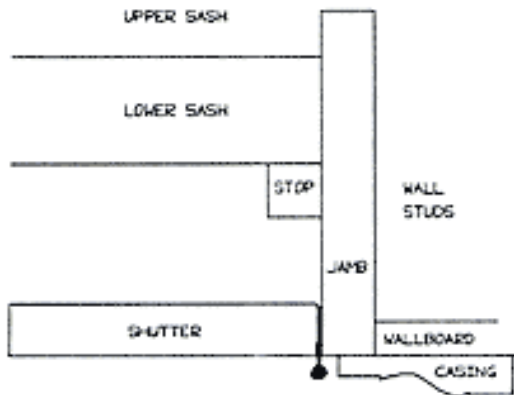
INSIDE MOUNT; SHUTTER FOLDS BACK AGAINST CASING
